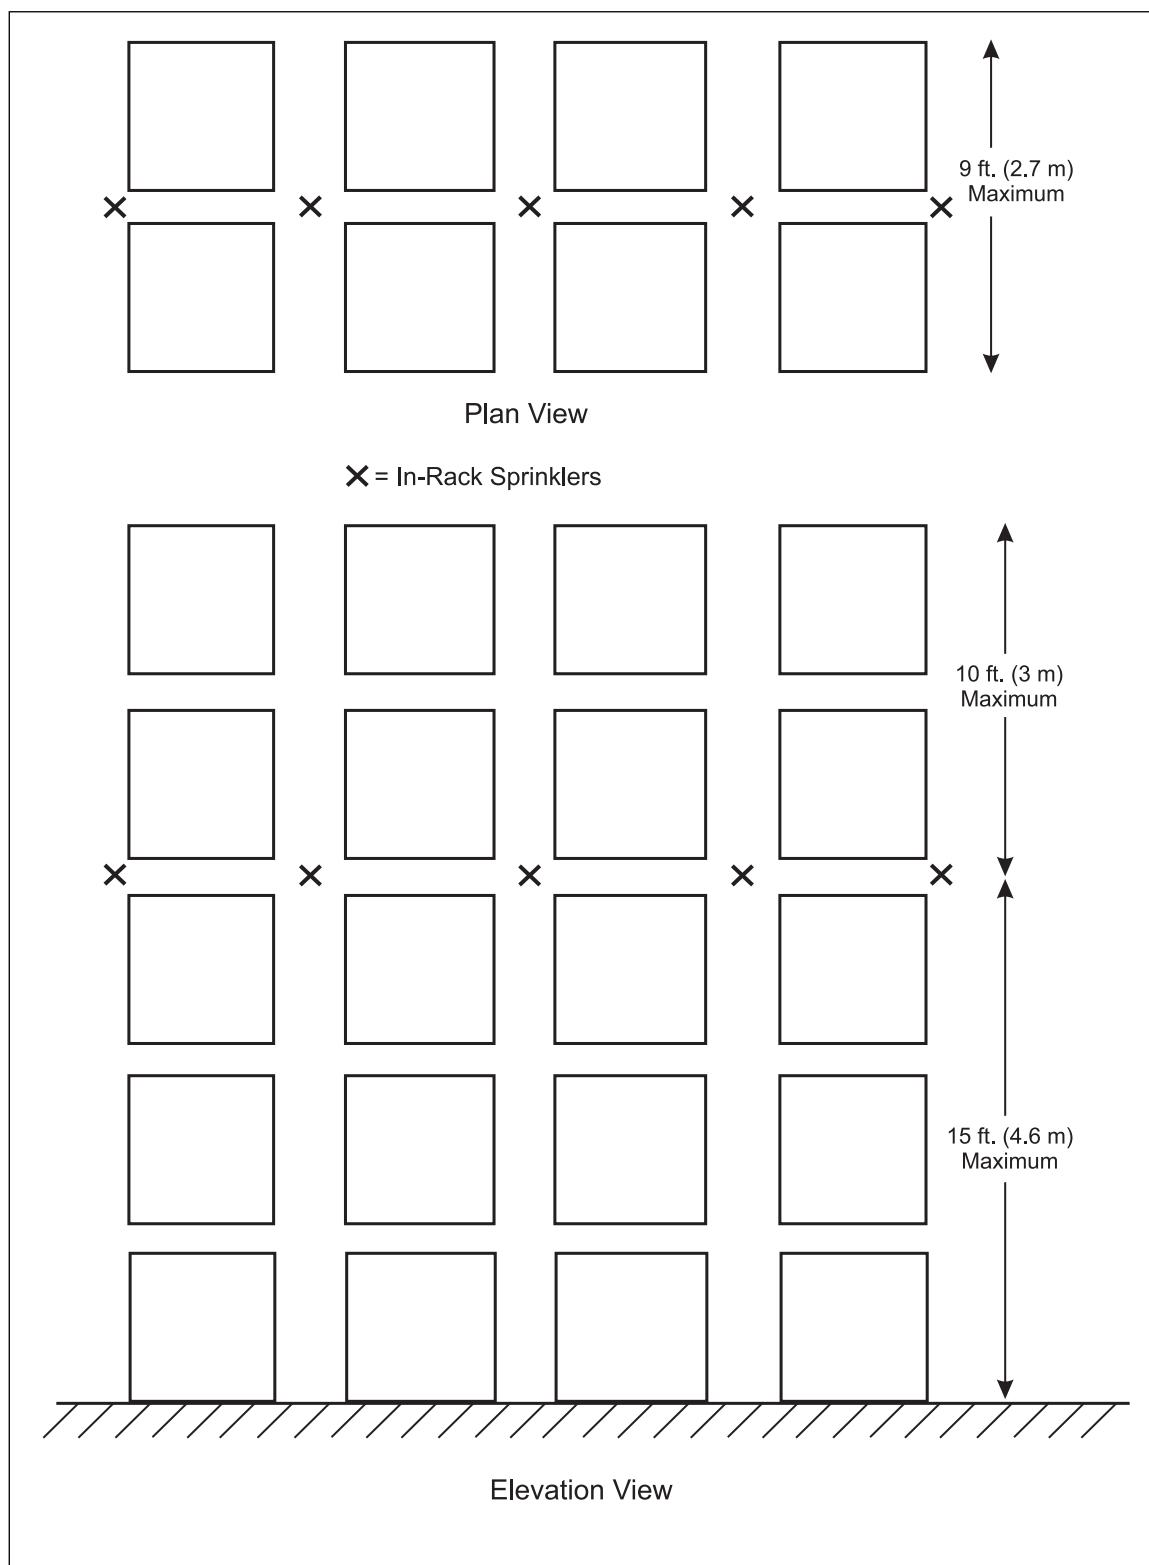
Double-row rack sprinkler layout: quick response sprinklers protection scheme
